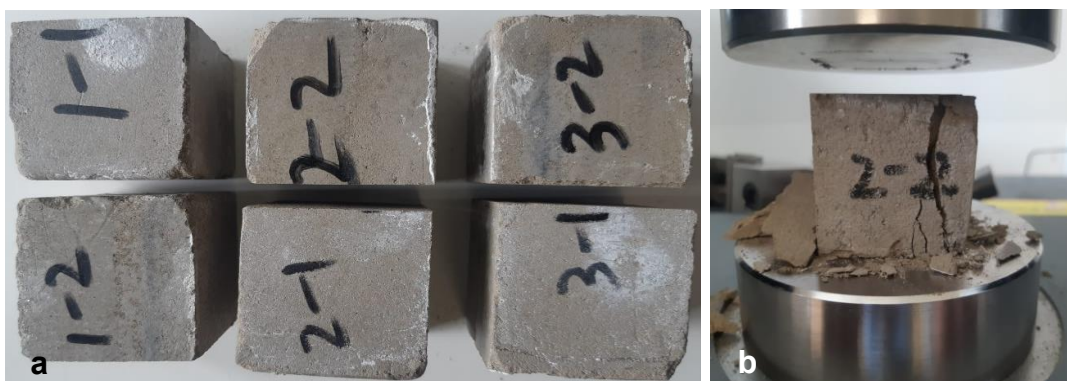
45. Cubic brick samples (a) and compression testing (b)
